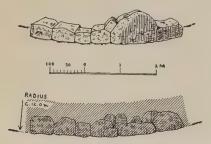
Ground Plan and Elevation of a Portion of the Retaining Wall (Fig. 14, R) of the Old Orchestra-Terrace (after Dörpfeld).
